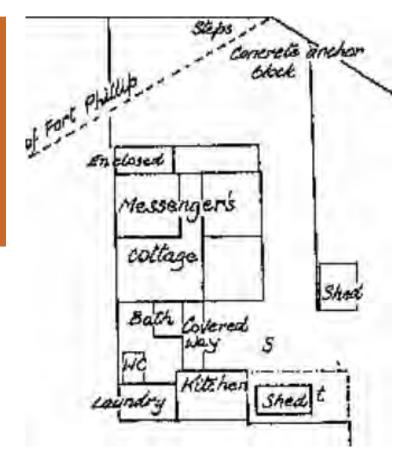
Detail from a sketch plan for Observatory Hill showing the general layout of the Messenger's cottage, 1991. (Source: Sydney Observatory, A Conservation Plan for the Site and its Structures, James Semple Kerr, for MAAS, 2002)
